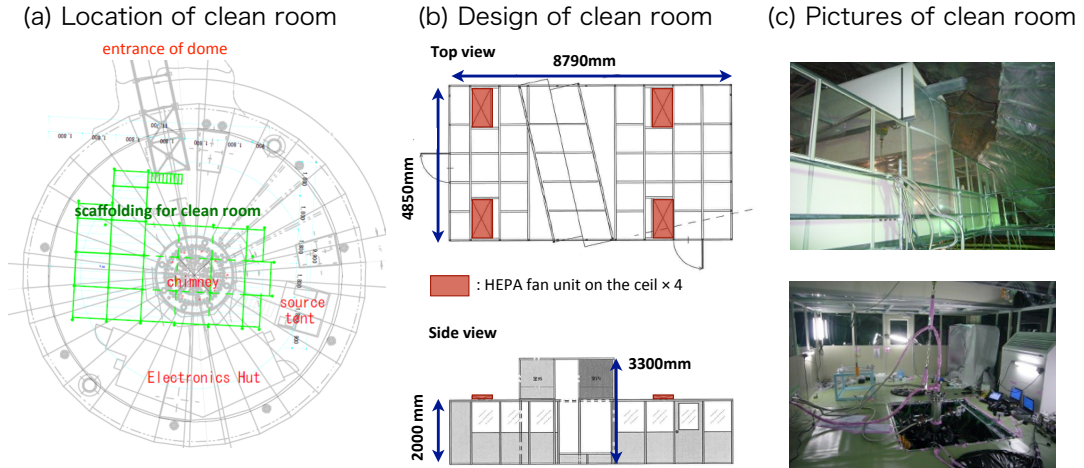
Design of clean room location and pictures. (a) shows design of scaffold construction for clean room on the chimney in dome area. The outside/inside view of constructed clean room is seen in (b)/(c).
